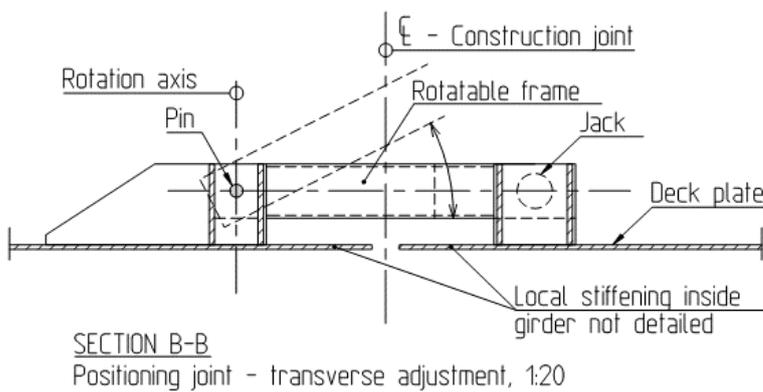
Pont de Normandie, jacking arrangement for vertical bridge positioning
